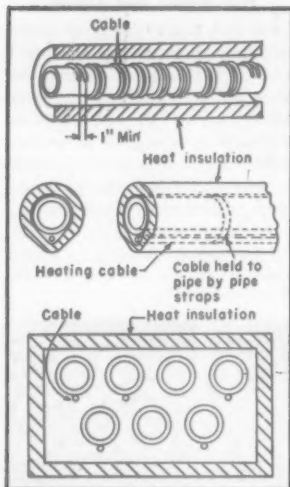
Pipe line with heating element covered with insulation to retain heat.
